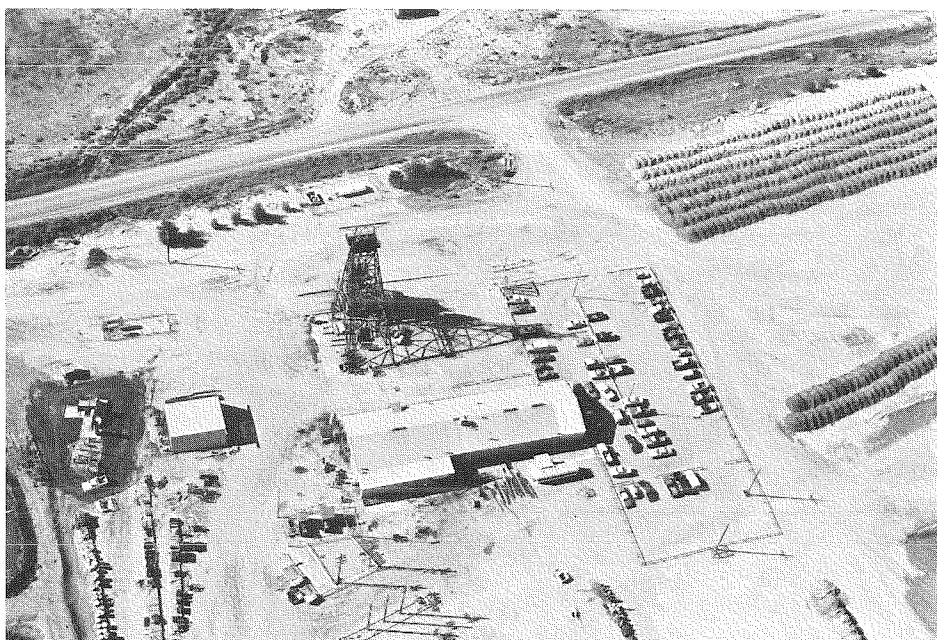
Surface facilities at typical underground uranium mine in Ambrosia Lake area
